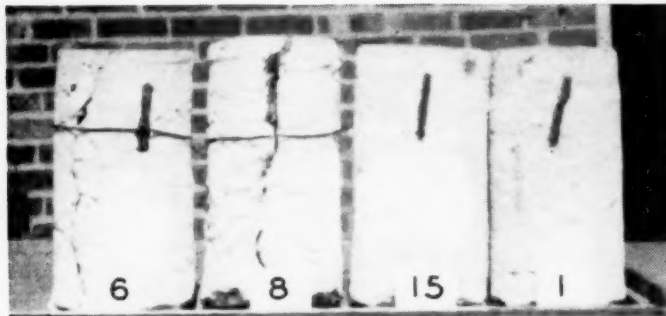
TYPICAL CORES DRILLED AT THE LONGITUDINAL JOINT IN THE 1942 KENTUCKY PAVEMENTS.
